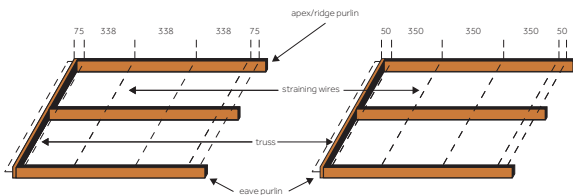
Diagram A – 150mm sidelap joint. Straining wire central to overlapping.
